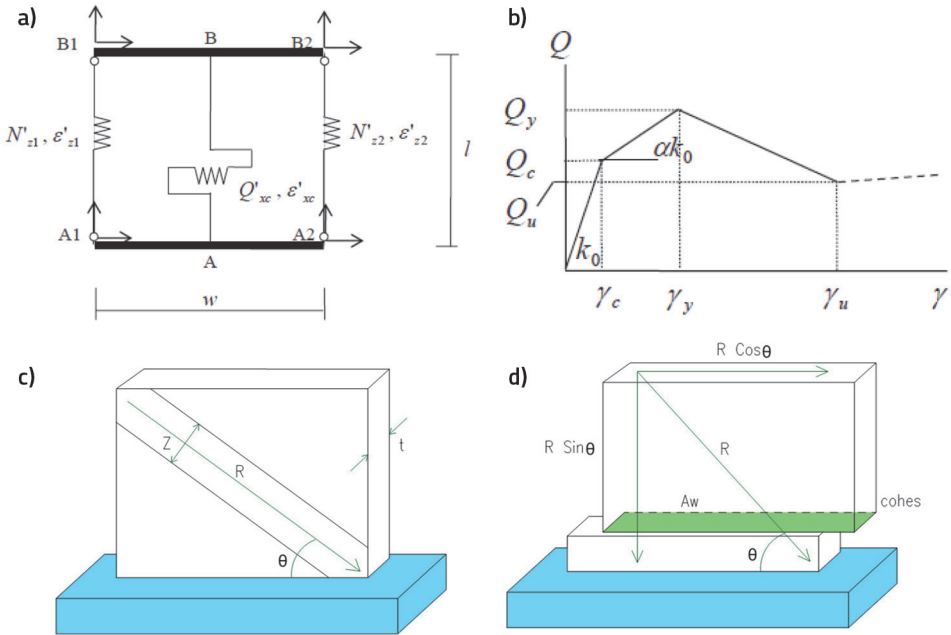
a) Element model for brick masonry wall; b) Force-deformation relationship of shear spring for brick masonry wall; c) Compressive strength of diagonal strut; d) Sliding shear strength
